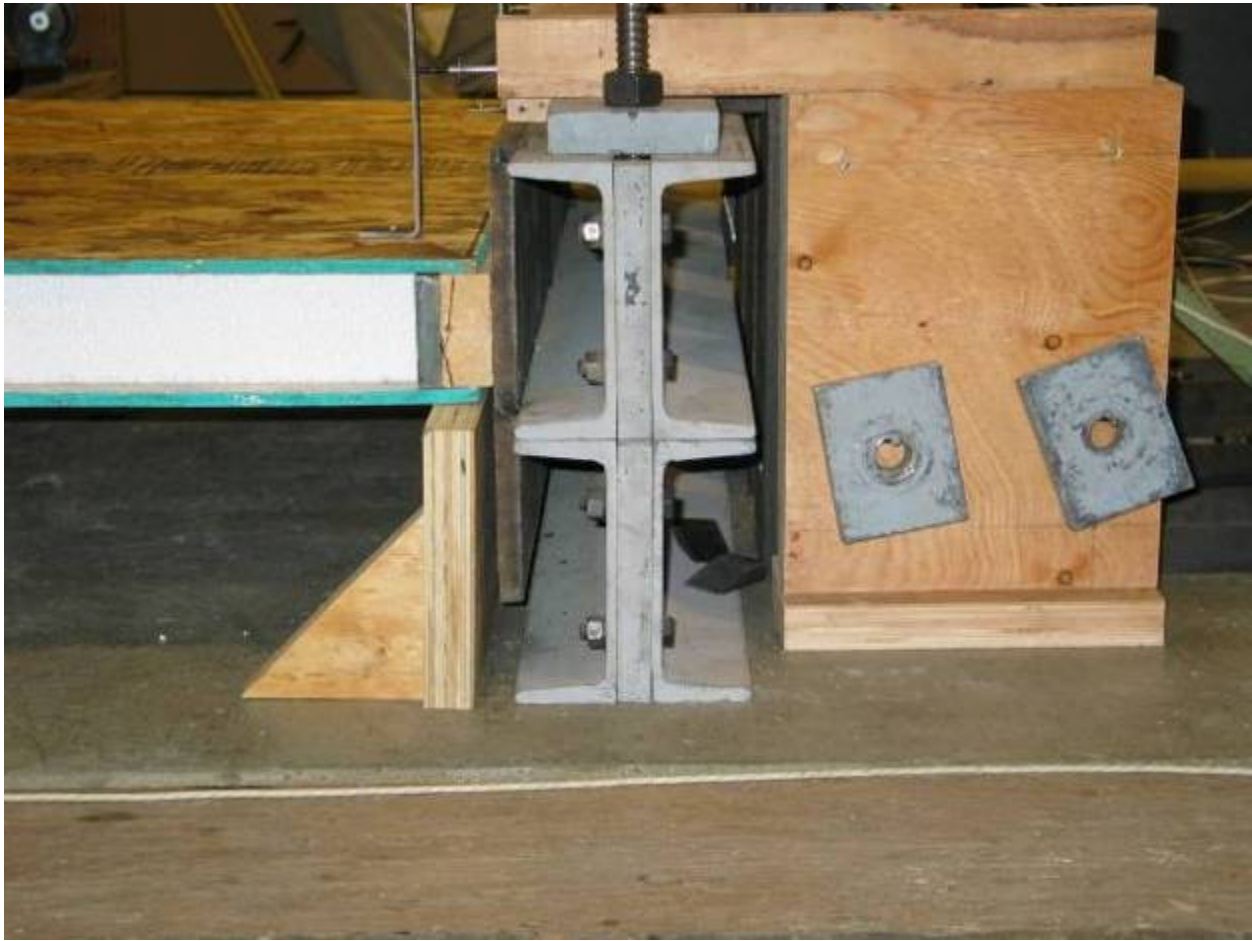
AXIAL (COMPRESSION) LOAD TEST ASSEMBLY – REACTION BEAM
